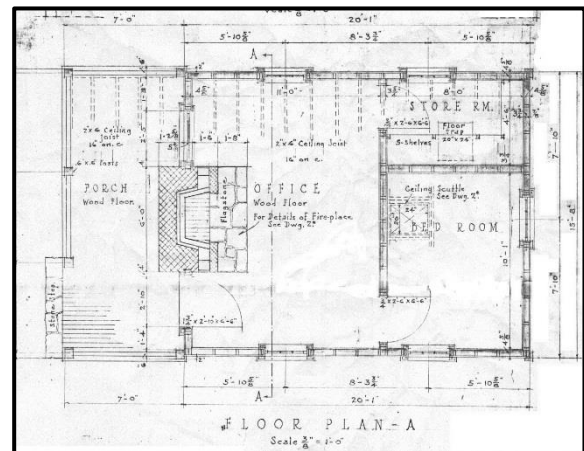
Floor Plan, Observer's Cabin, State of New York Conservation Department (Detail from Sheet 1 of 4) (NYS DEC)
